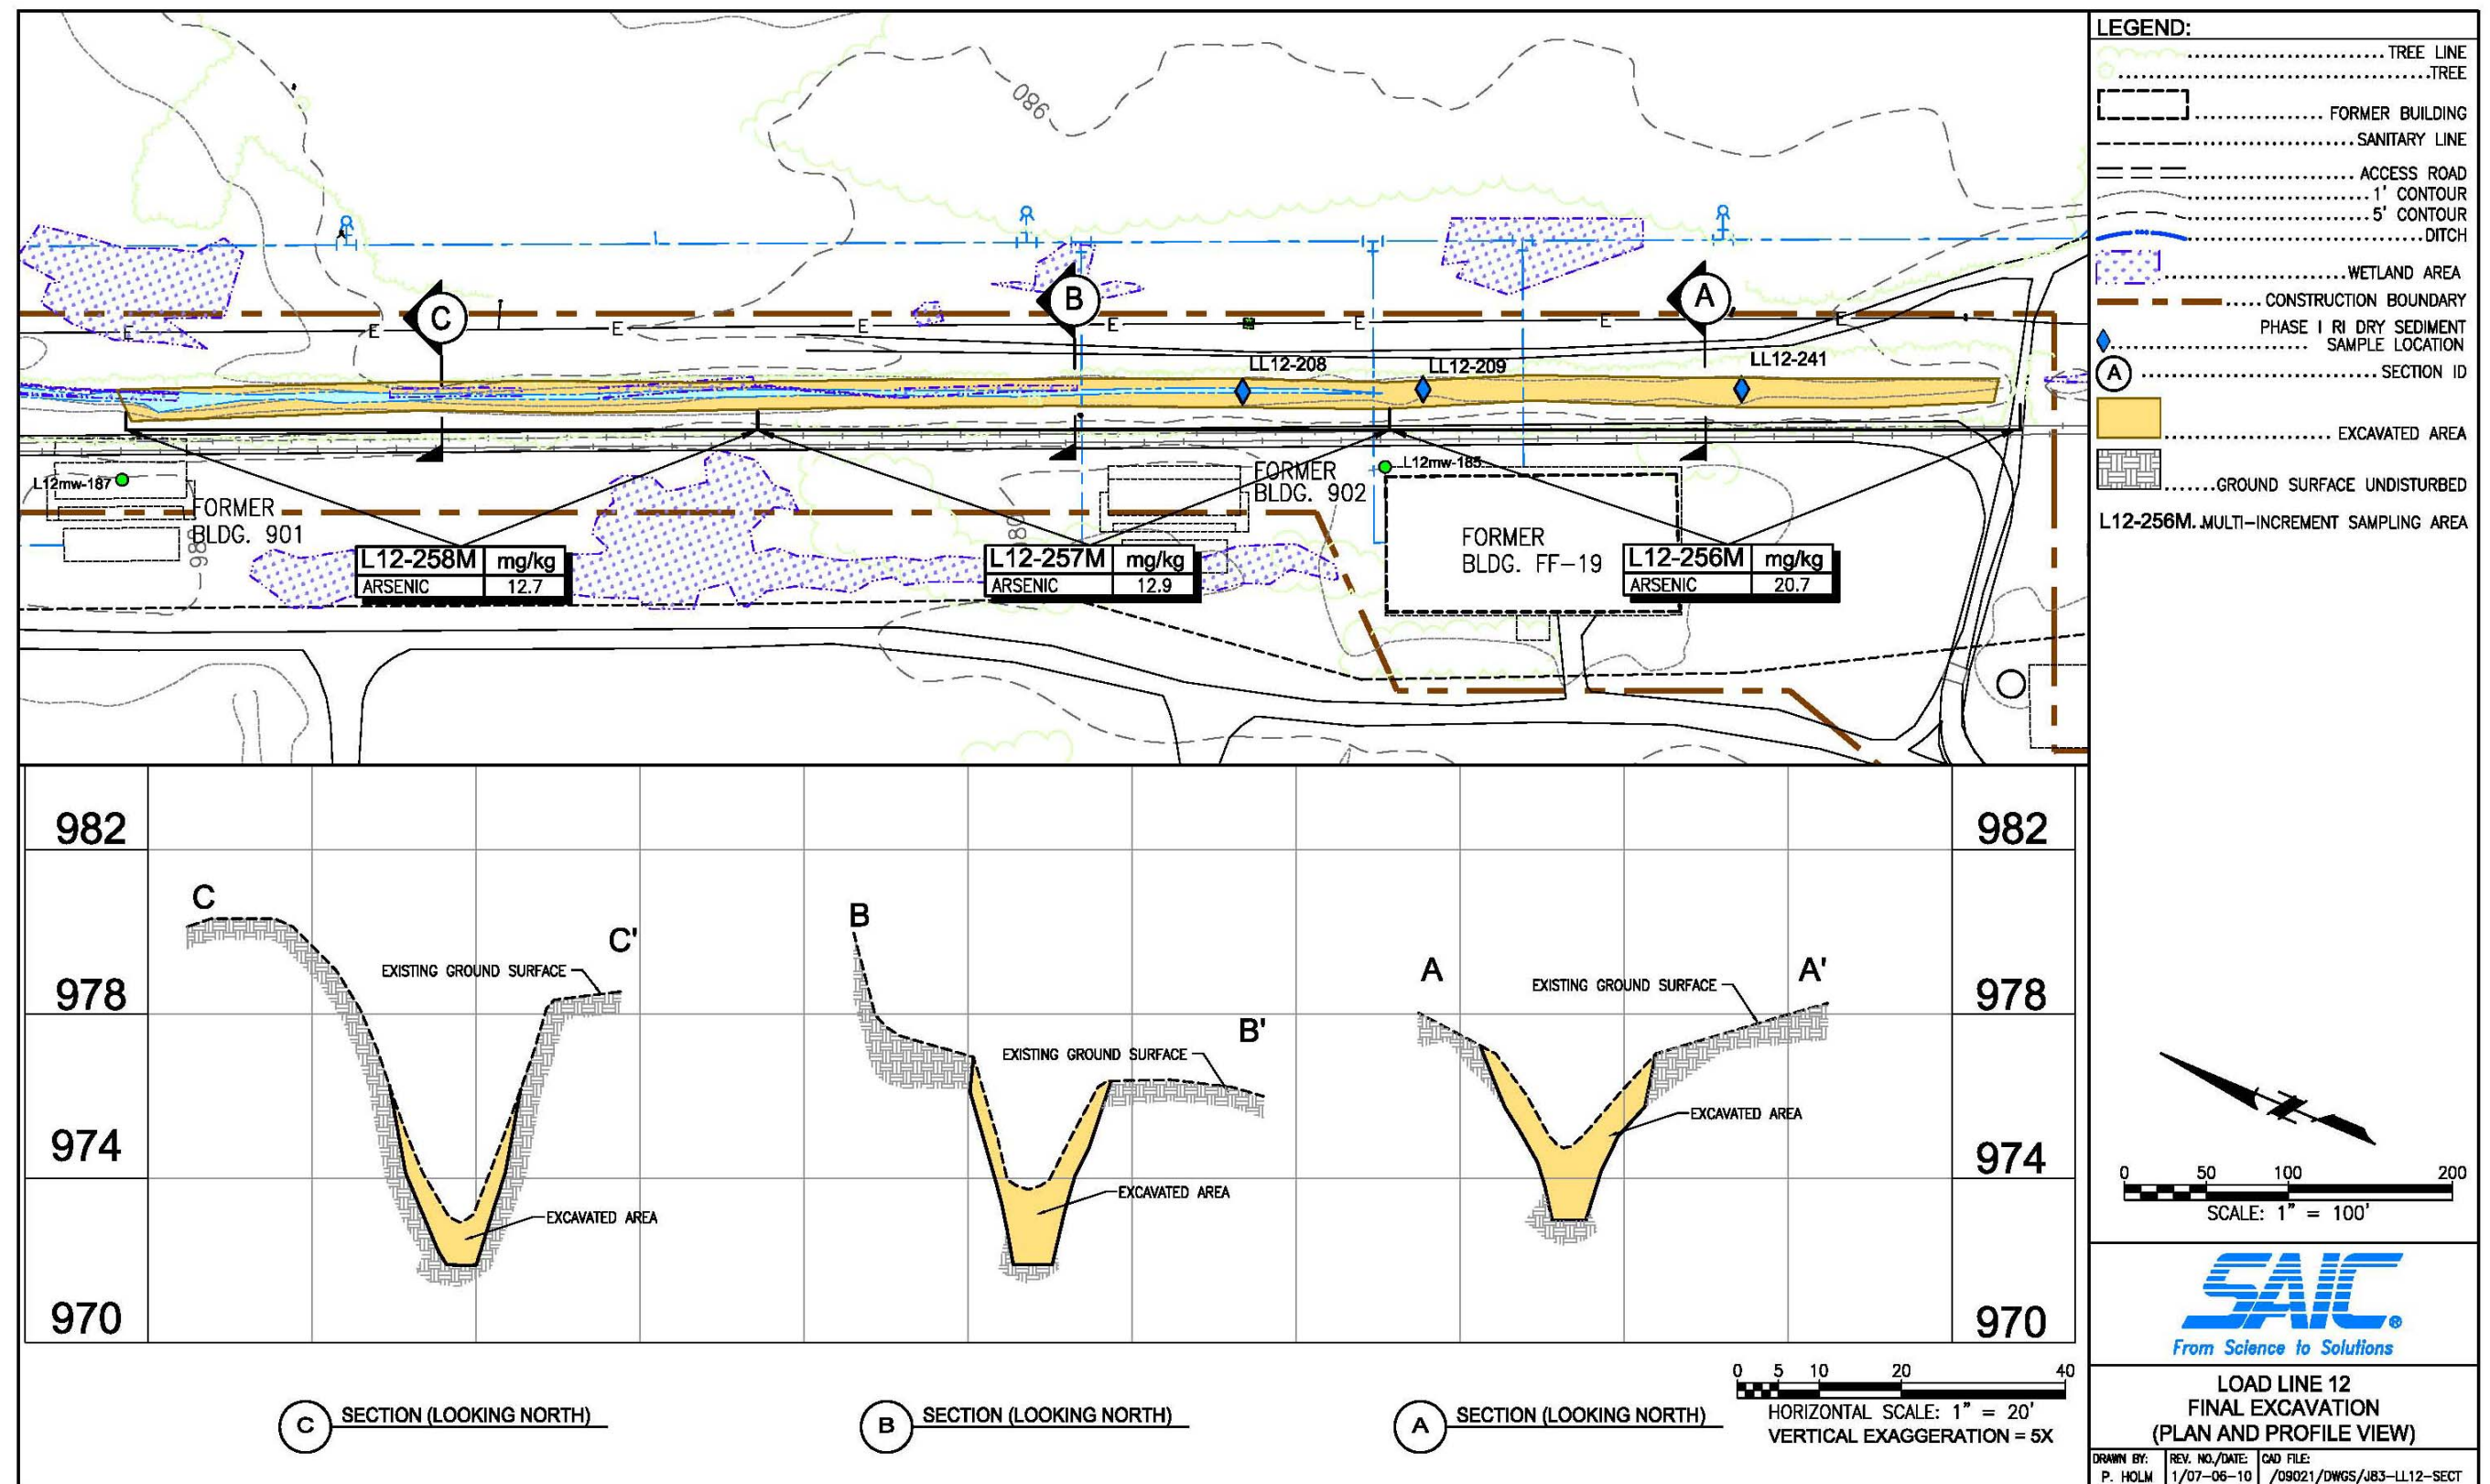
Load Line 12 Final Excavation (Plan and Profile View)
